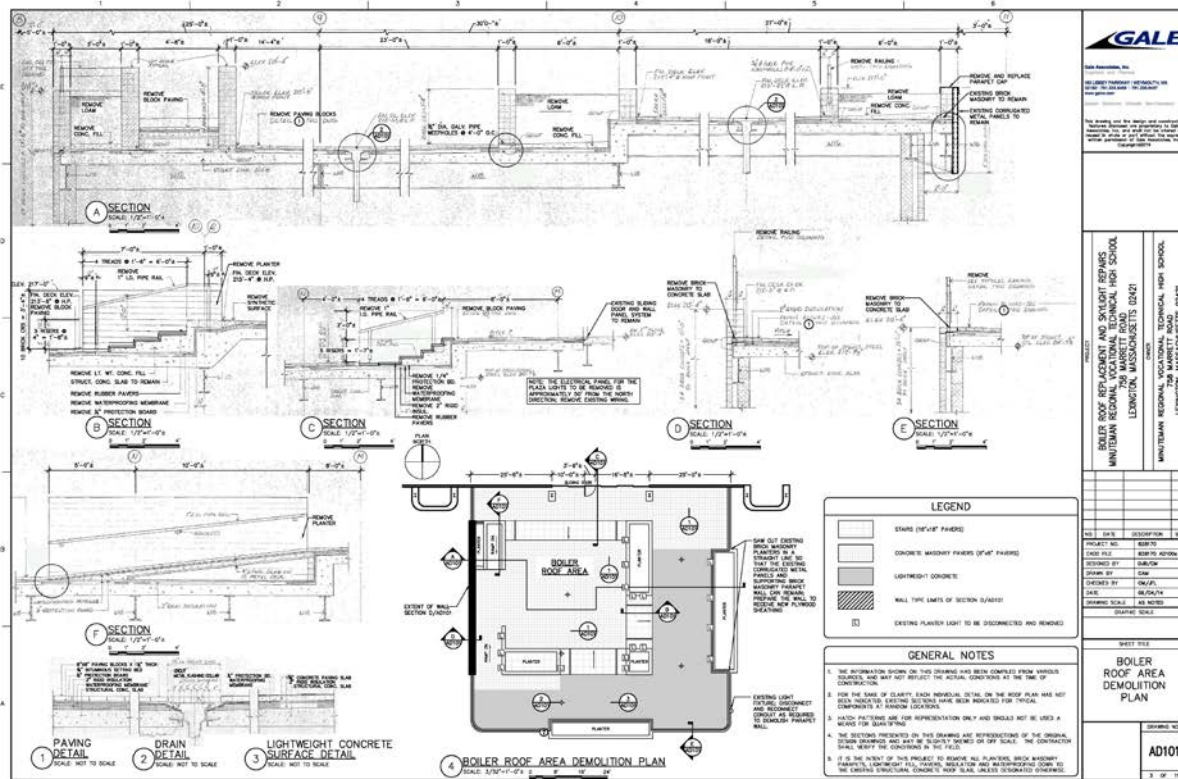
Image C – Gale’s Design Drawing which incorporates excerpts of the original design drawings.
